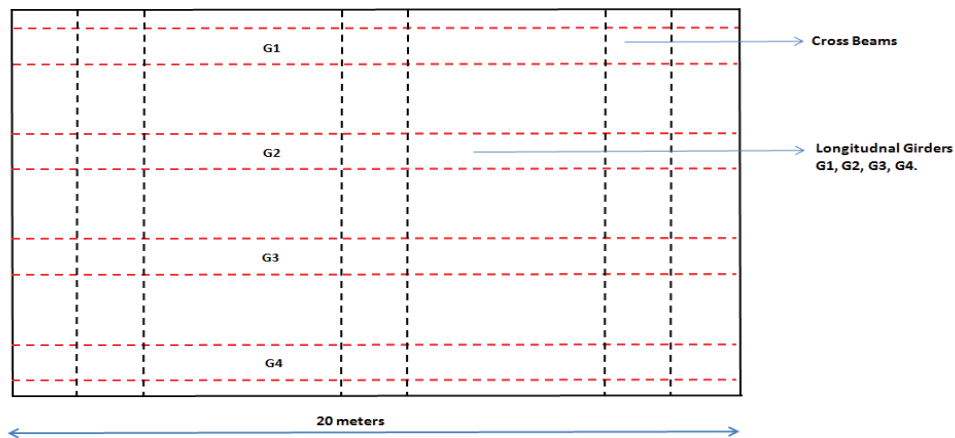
Plan view showing arrangement of cross beam and longitudinal girders
